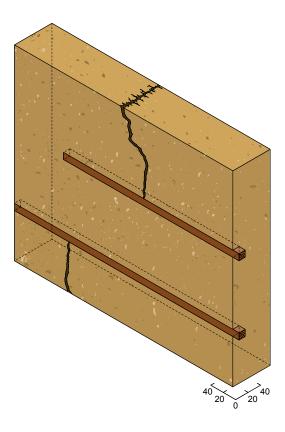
System of 'simple' timber lacing acting as a crack stopper. CAD: Martin Pospichal.
